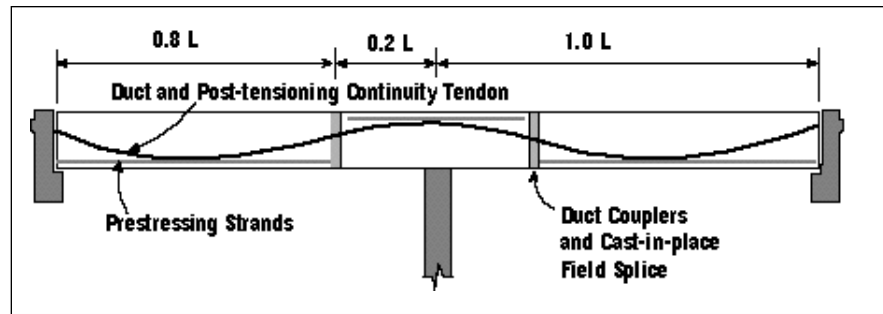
Field post-tensioning of precast/prestressed I-girder segments allows construction of clear spans which are 25% longer than those with single girders. For this configuration, girder reinforcement is very efficient because greatest handling and service load effects occur at the same locations.
